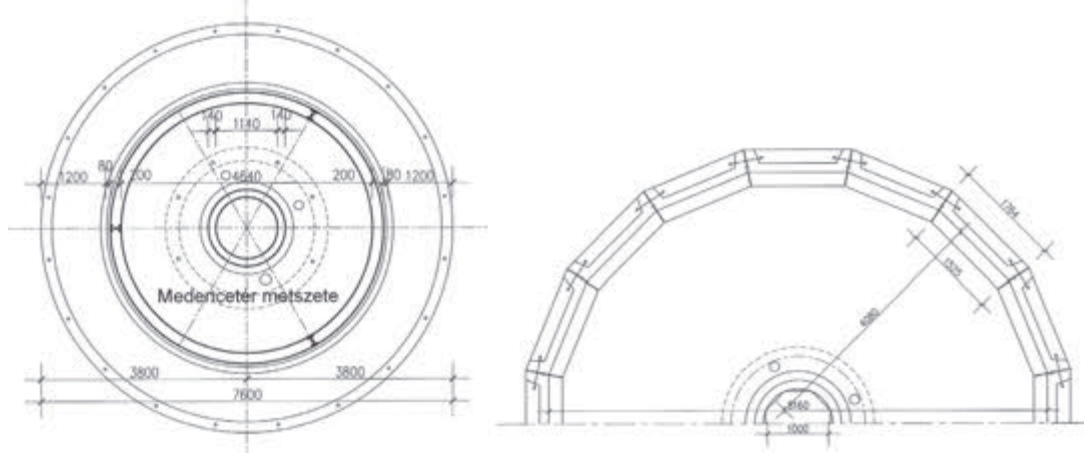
Tank horizontal sections (Type 1 left, Type 2 right)
